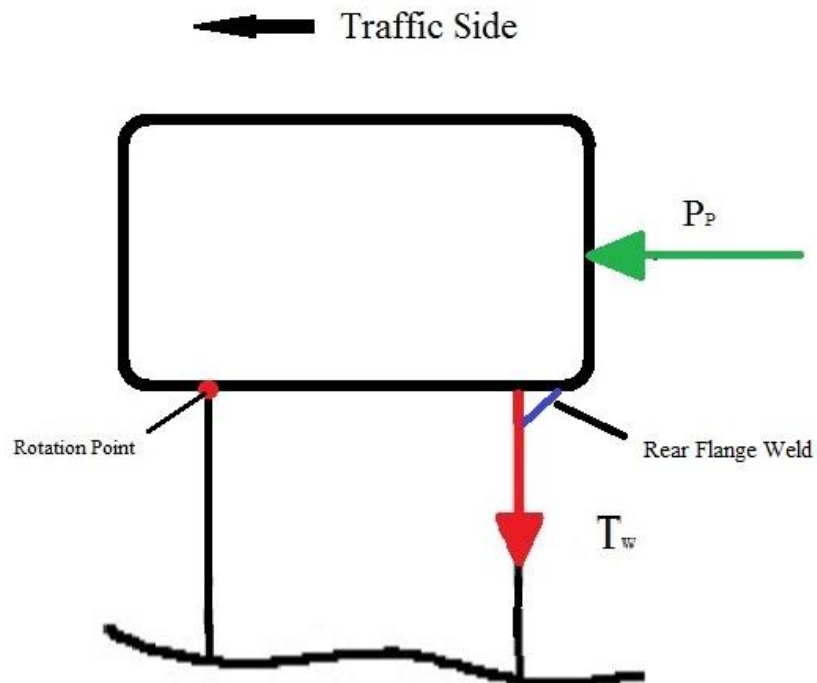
Rail-Post Rear-Flange Weld Tension
